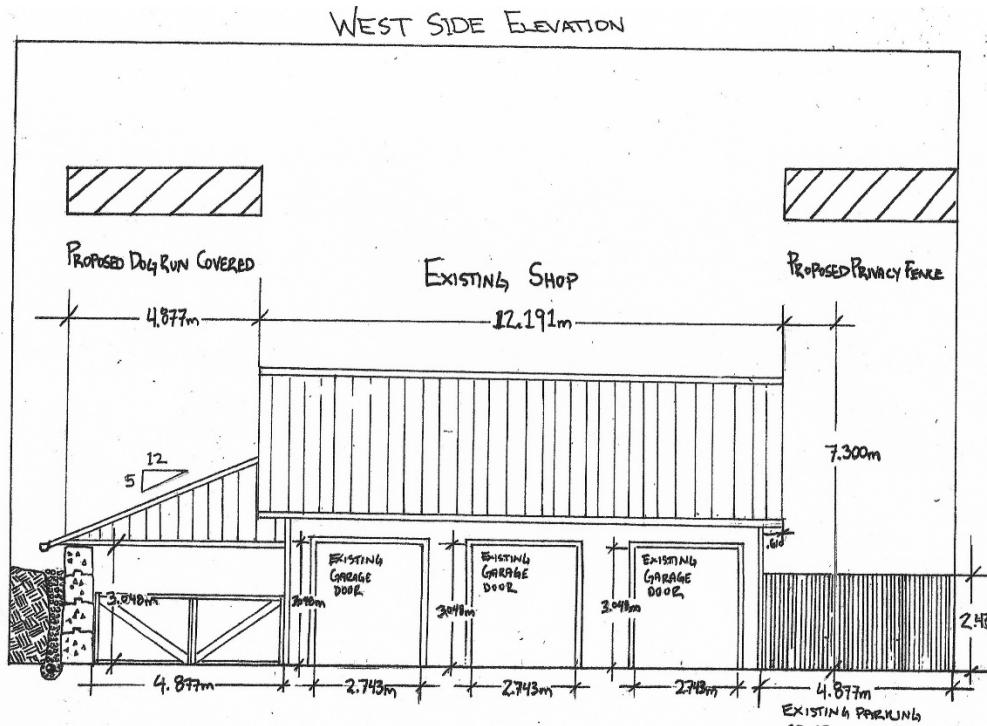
Proposed Covered Dog Run on Existing Accessory Building
